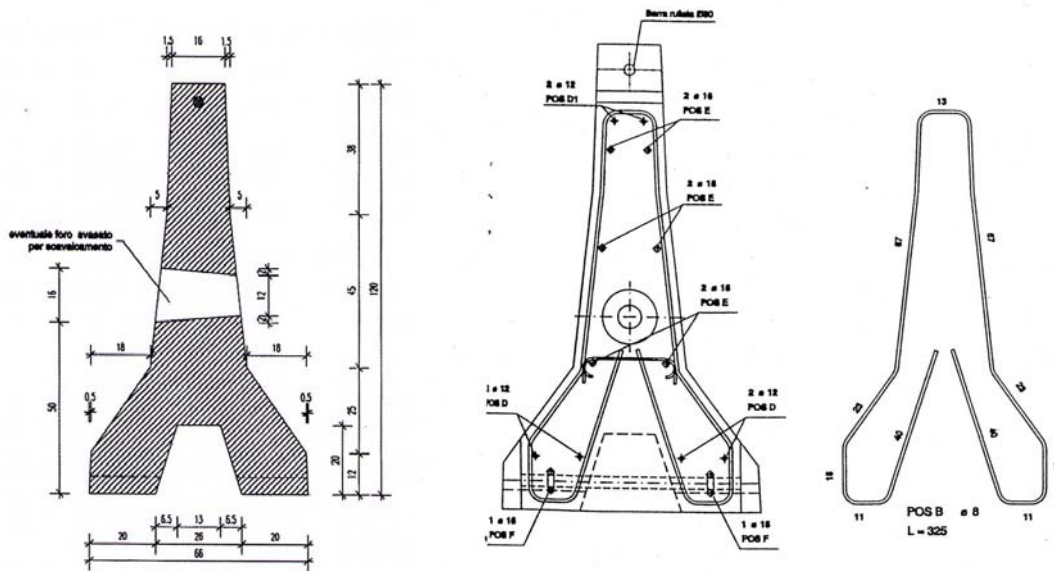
Cross section (left) and typical reinforcement (right) of the analyzed barrier
